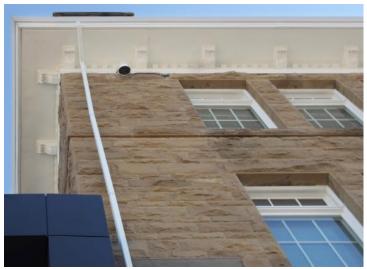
East façade – detail view of fenestration and windows on right side)
